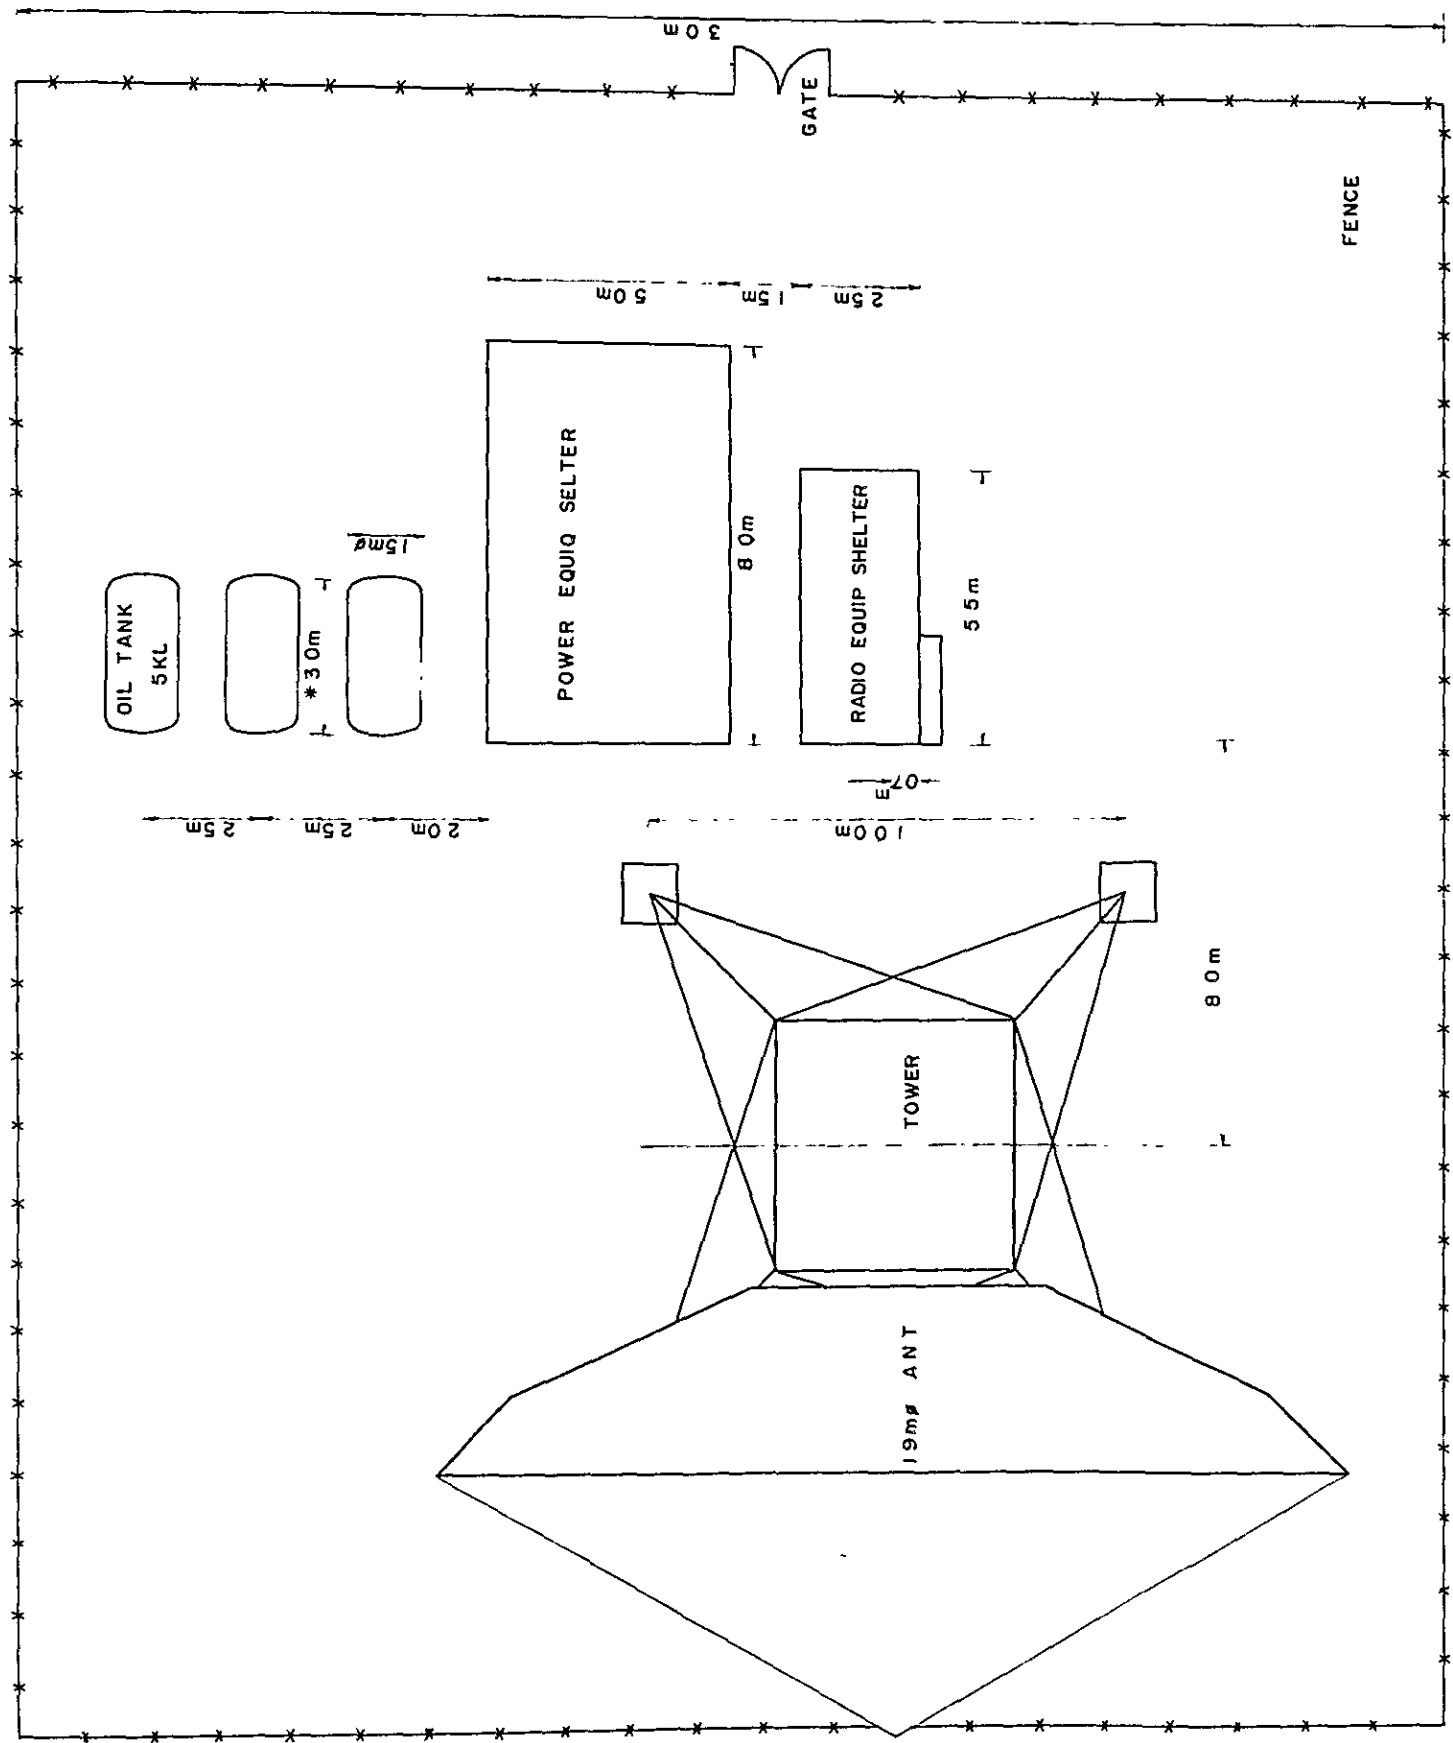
Typical Site Layout for UHF Repeater(2/2)
